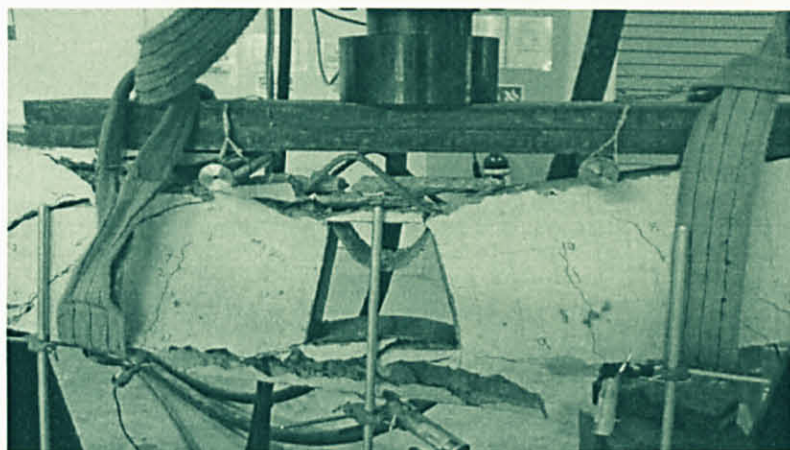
Failure of beam with large square opening at middle of the beam pasted with CFRP strips
